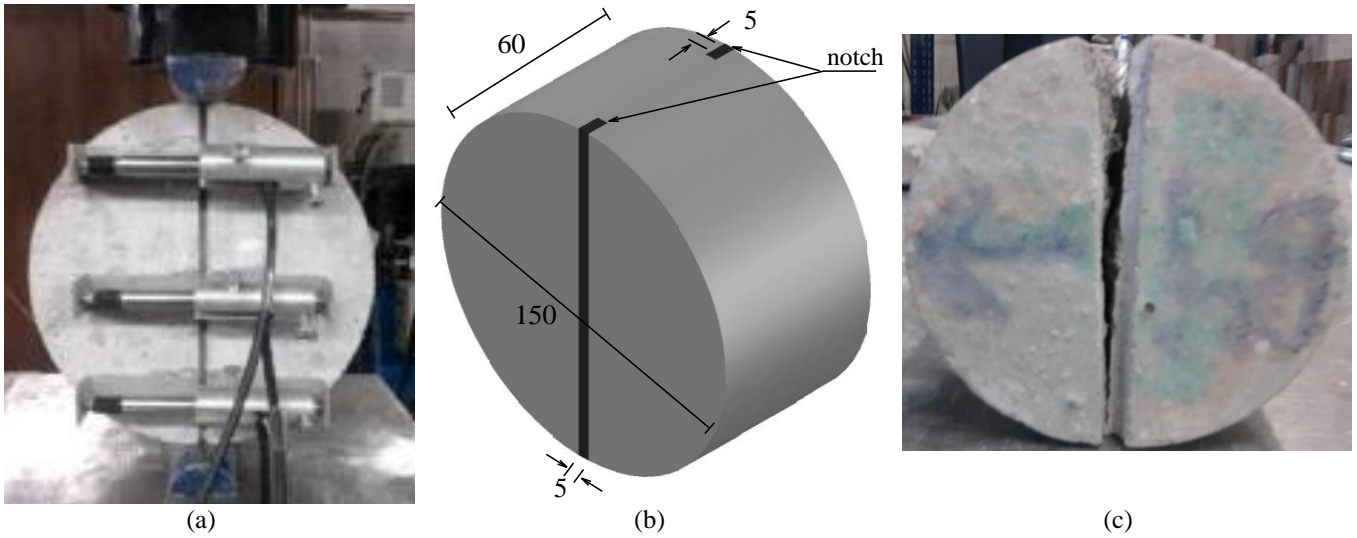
Details of the splitting tensile test: (a) setup of the test [24]; (b) geometry of the specimen, dimensions are in mm; (c) experimental crack pattern at the failure stage [25].
